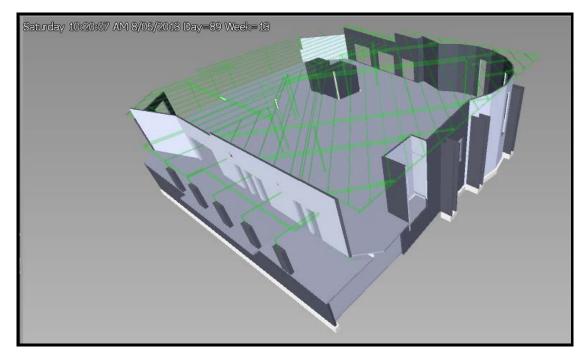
Building Approval Stage (Viewpoint 1) - Works Complete Week 13
